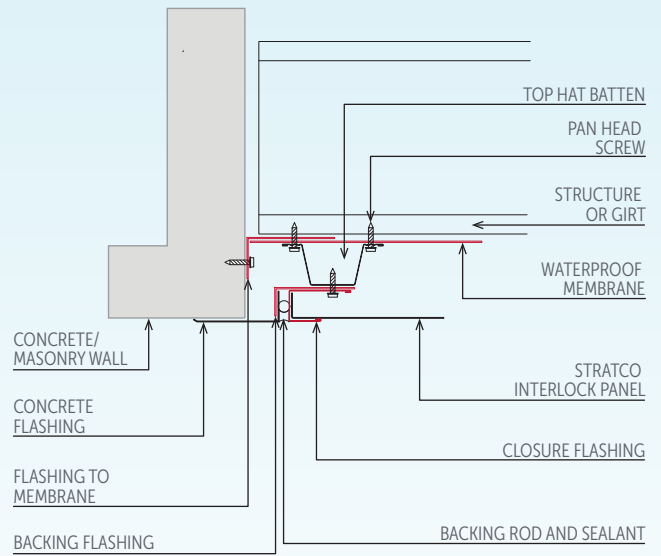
SIDE OF FACADE FLASHING DETAIL
